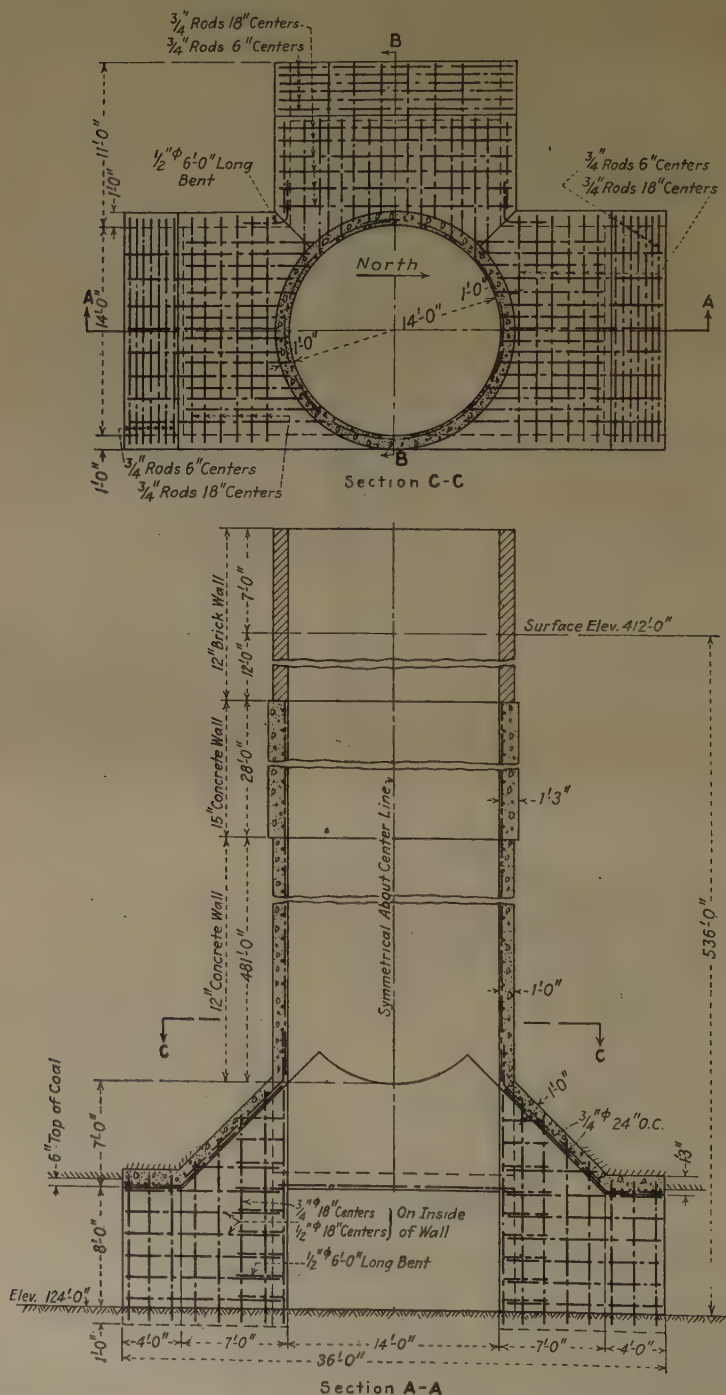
SECTION A-A, AND C-C, NEW AIR SHAFT, NEW ORIENT MINE.
